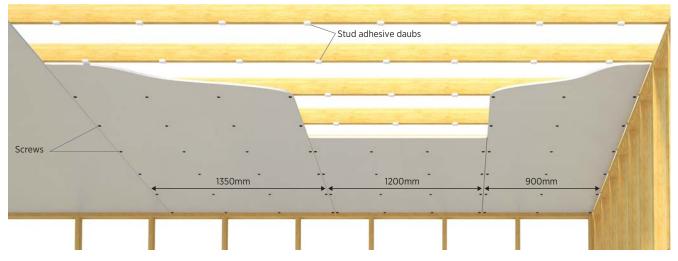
Combination adhesive and screw fixing to ceilings – 1/3 fixing method
